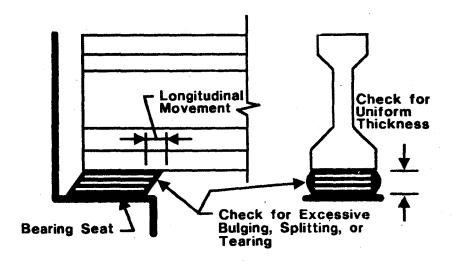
Elastomeric Bearing Inspection Checklist Items
